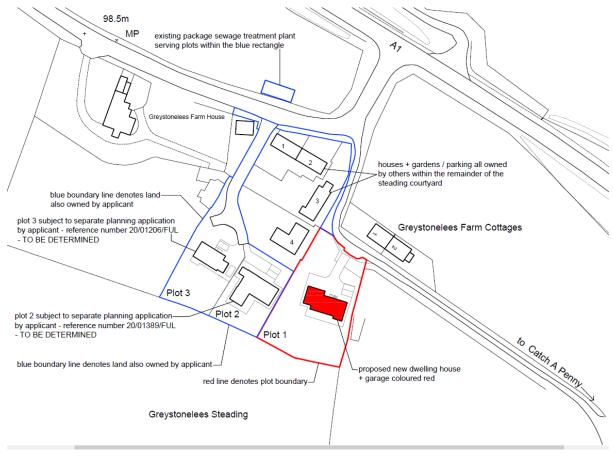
Extract from HWAD-209-MWD-103 Location Plan (Source: Hodgson White Architecture + Design).
